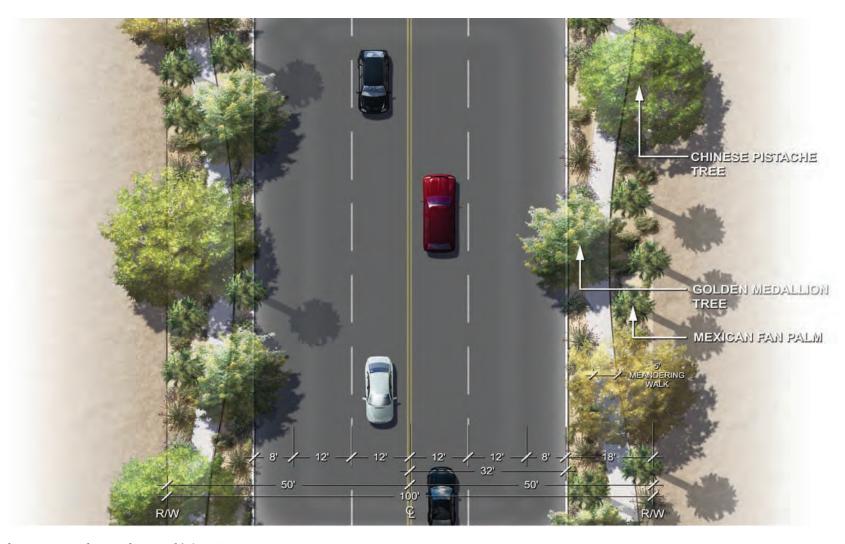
| Themed Road(s) - A Plan (100' R.O.W.)
